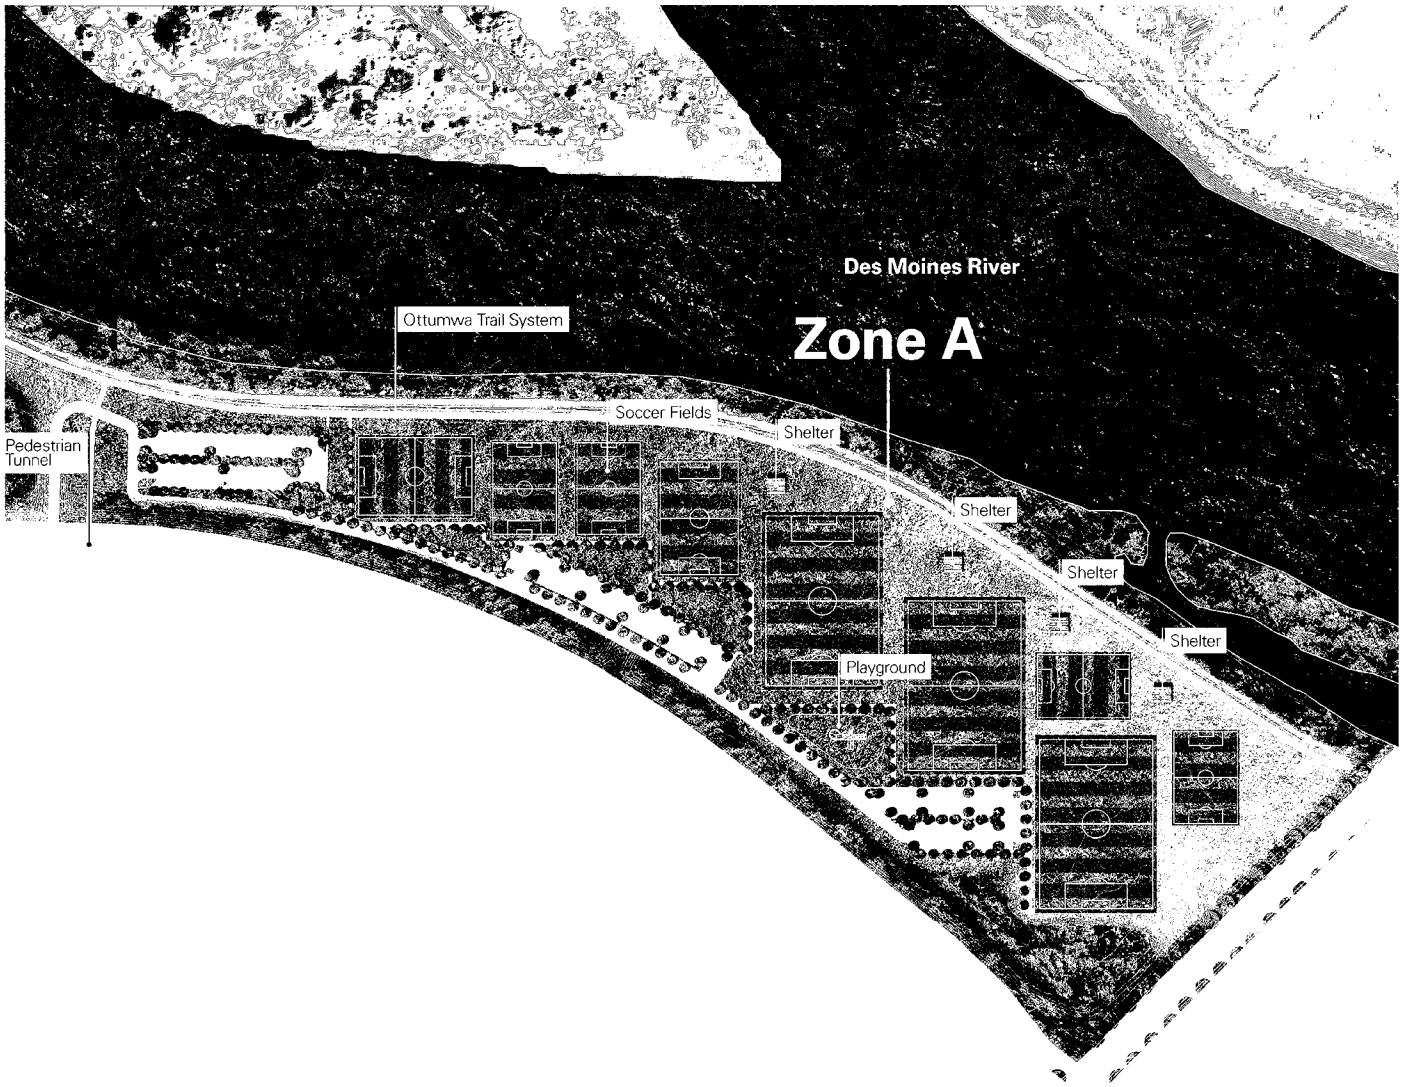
Master Plan Alternate 1, Zone A - Alternate 1B
